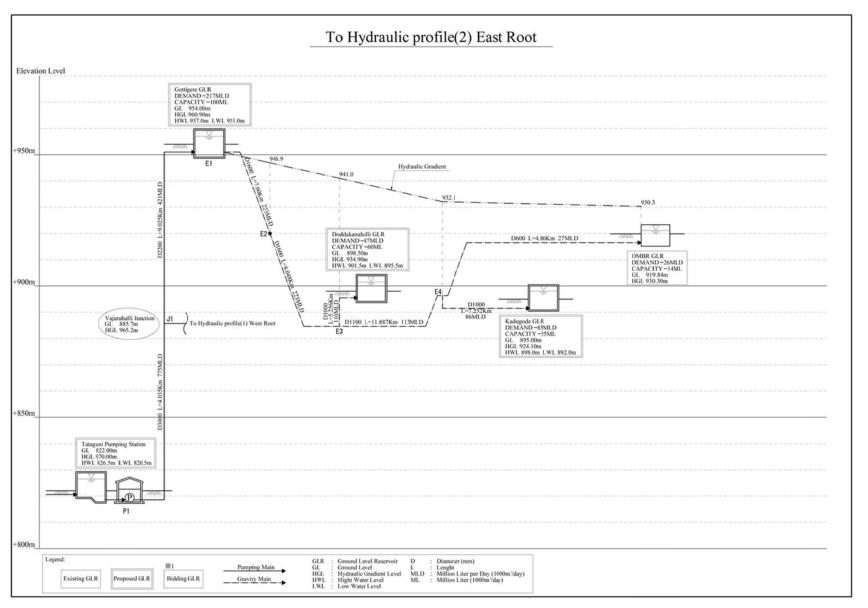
Hydraulic Profile of City Trunk Main in the East Route
